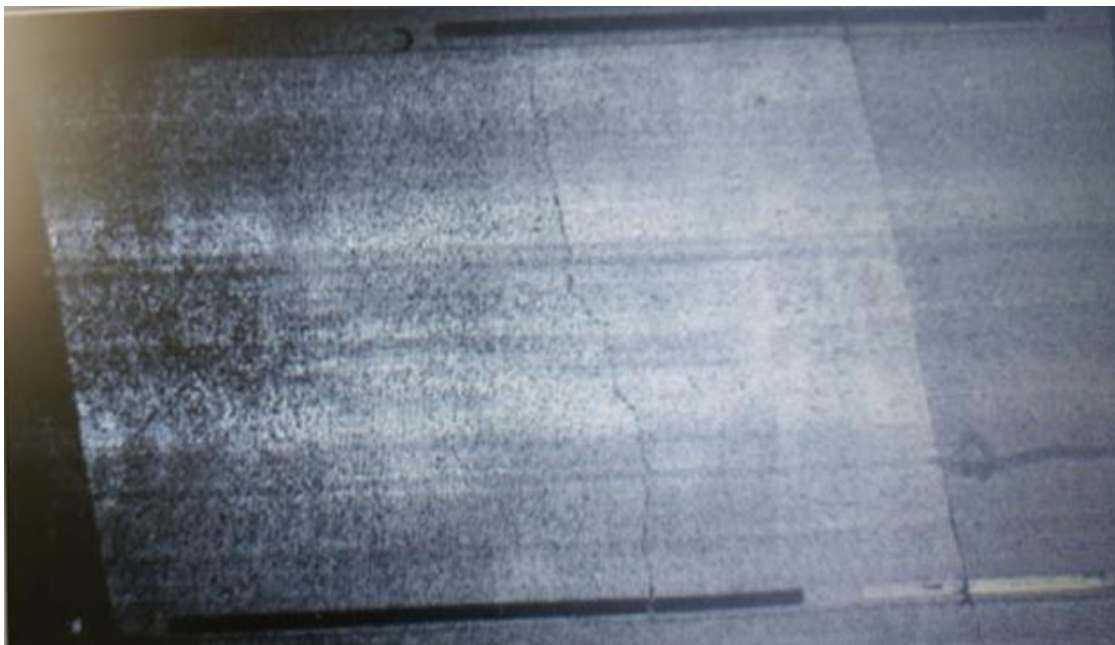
Photo of a transverse crack of a RSC slab with skewed joints.
